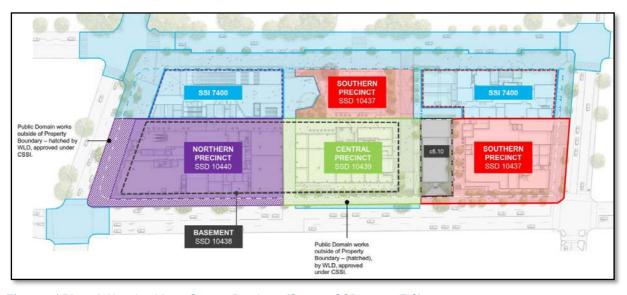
| Plan of Waterloo Metro Quarter Precincts (Source: SSD 10437 EIS)
